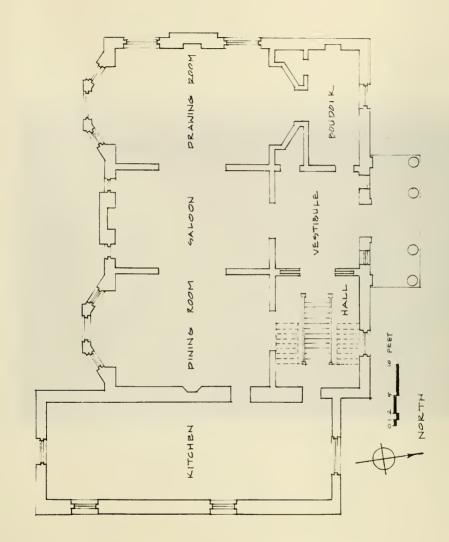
Powel Mansion First Floor Plan Drawing by author after Addison Hutton drawing of 1883
